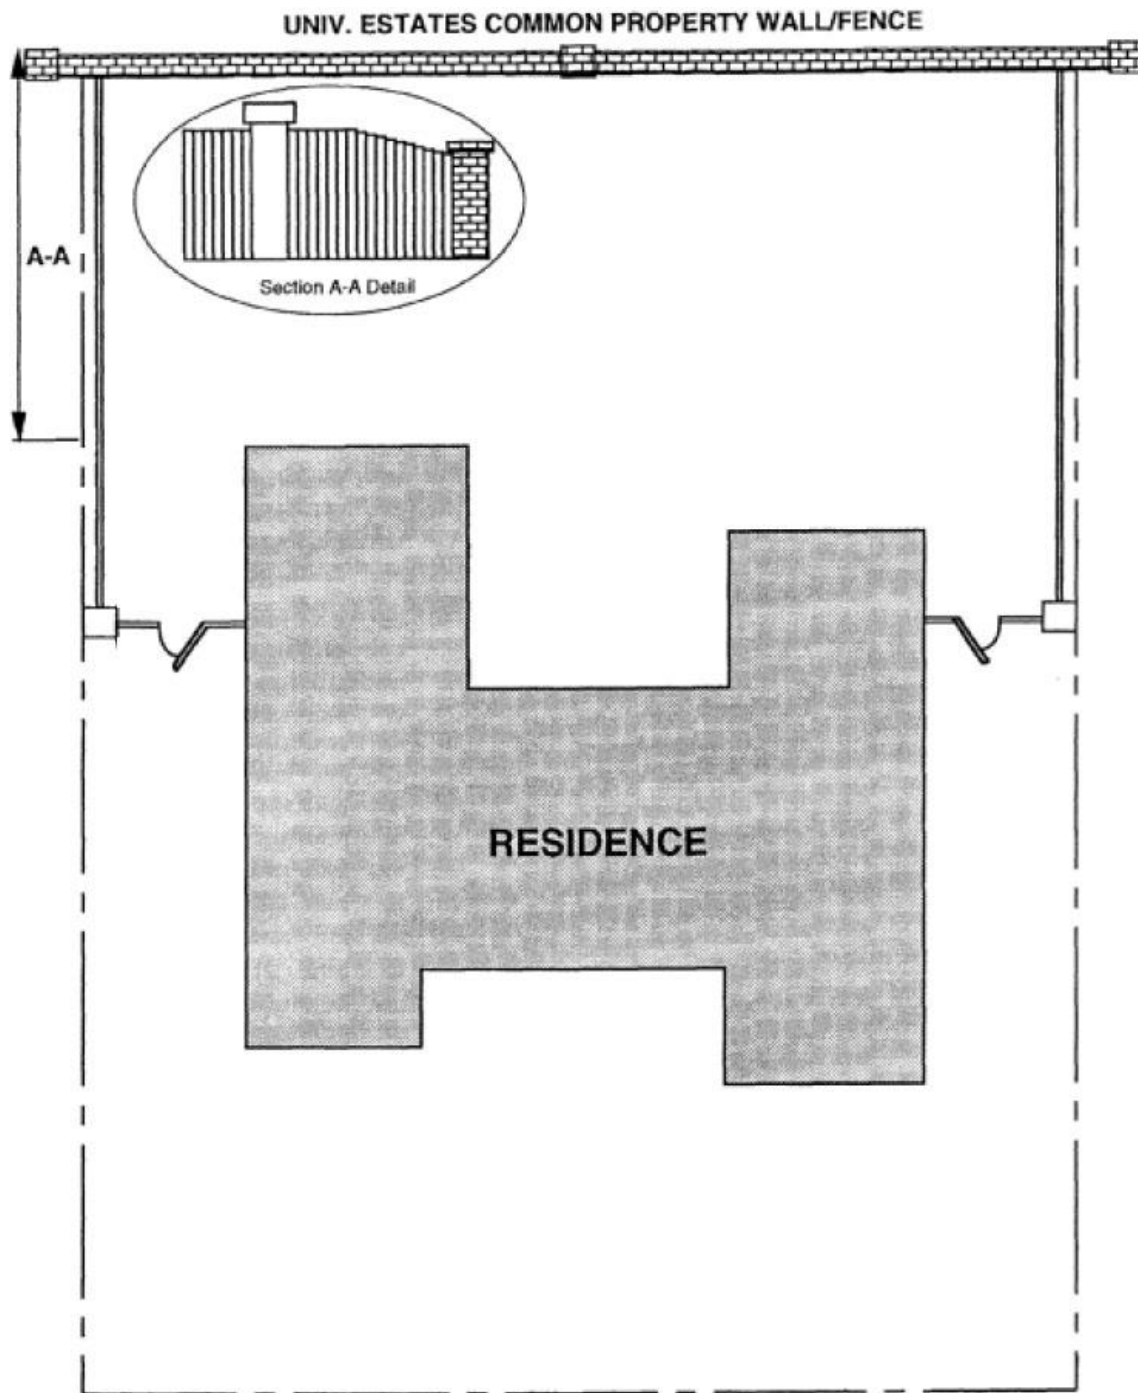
SUGGESTED FENCE SITE PLAN
